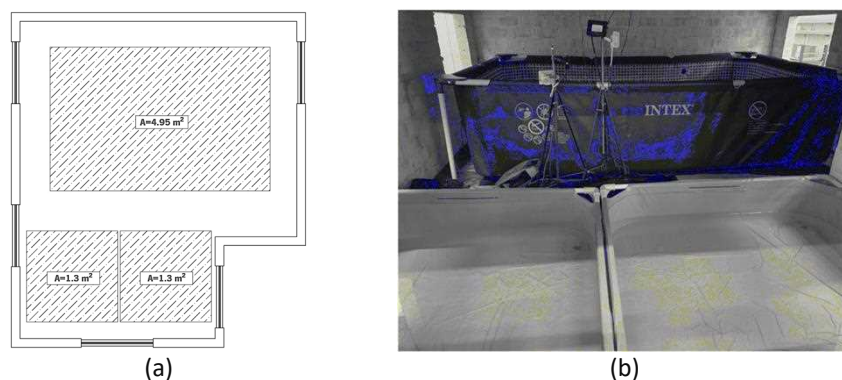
Placement of the additional weight on each slab: (a) arrangement of the water pools on the building plan, (b) portable metal frame pools located on the first floor.
